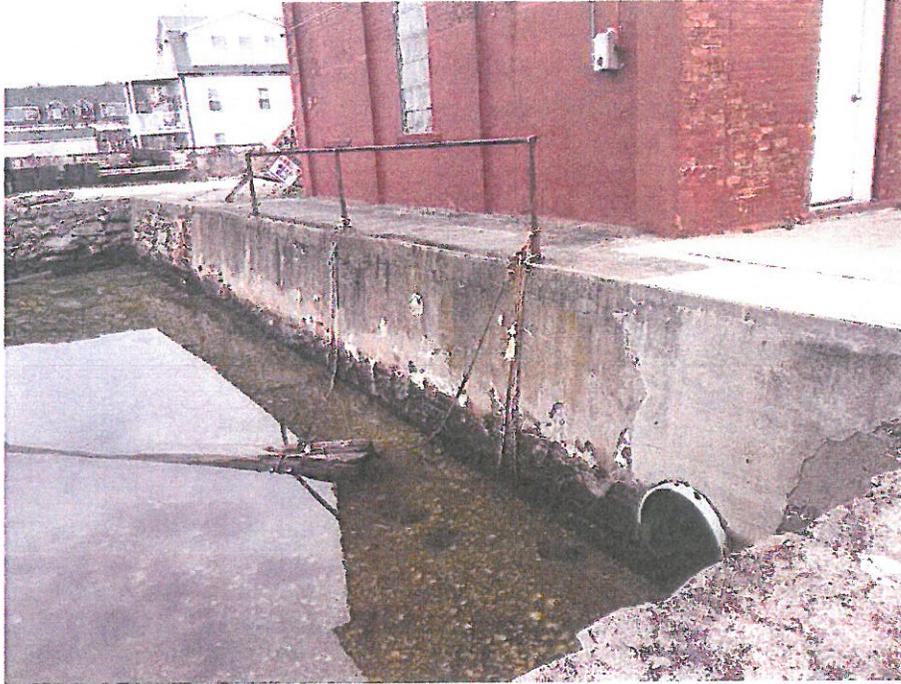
Concrete seawall behind the fire station along the west face of Lot 21, with Bristol Harbor to the west.
